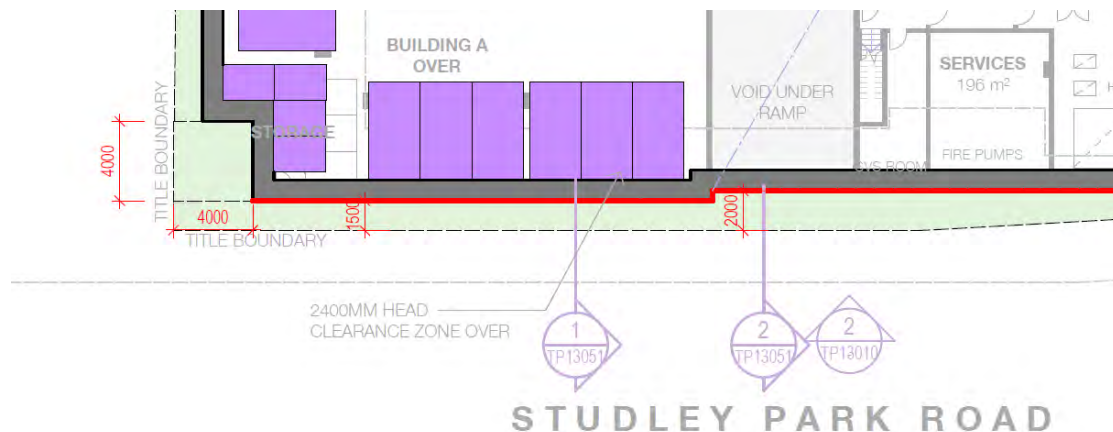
Proposed south-western deep soil zone & minimum 1.5m planting to Studley Park Road.
